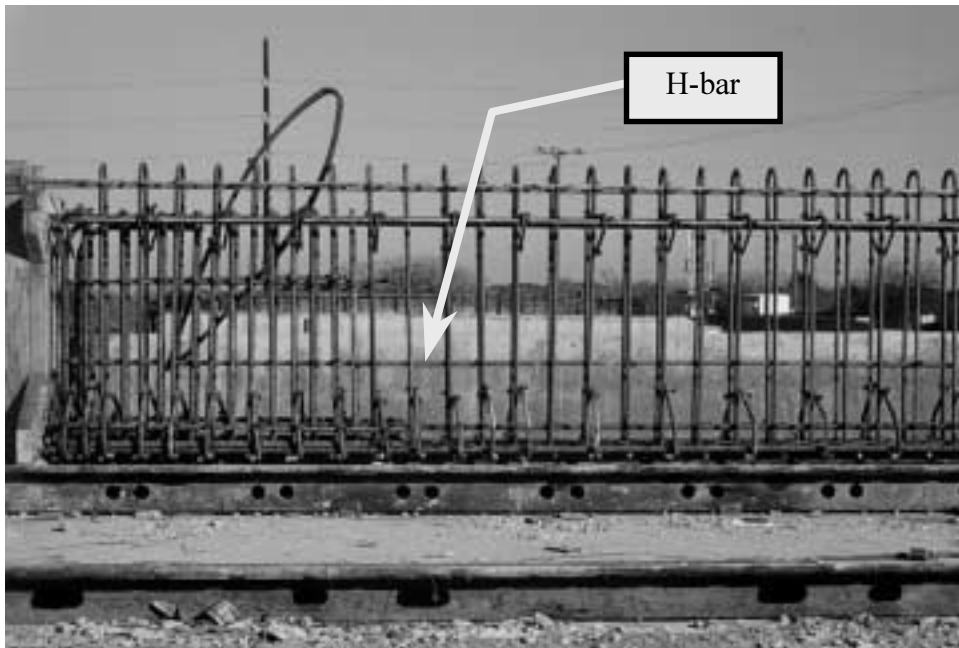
Anchorage Zone Reinforcement for Specimen L4B-C
